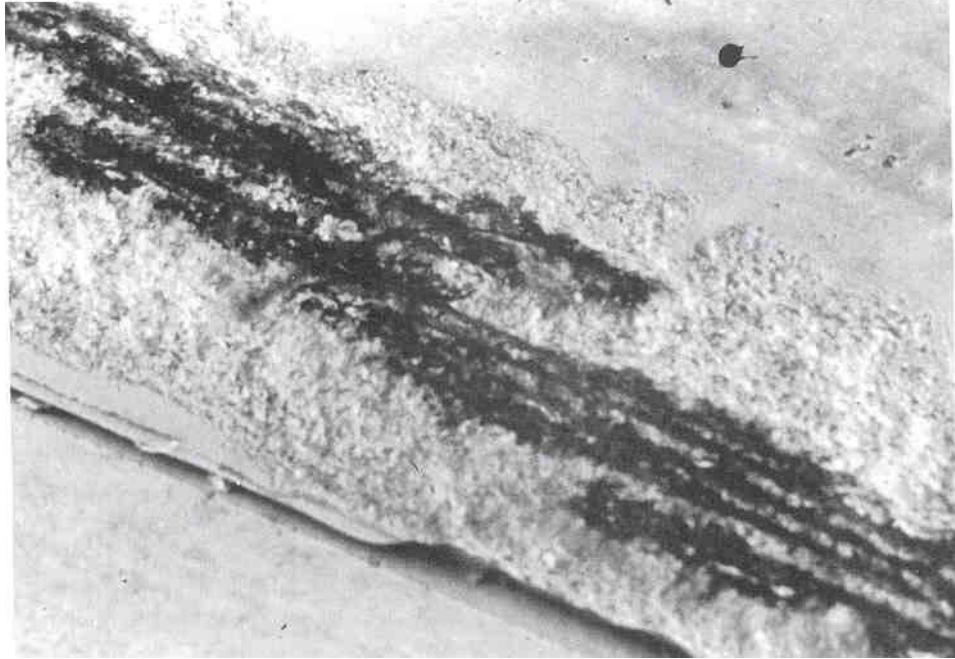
Exposed Strands in a Precast Slab Beam
